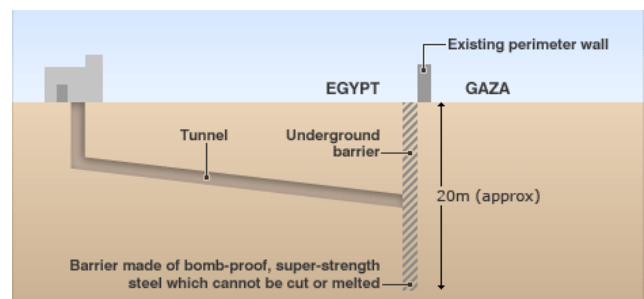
An underground barrier is set for construction by the Egyptian authorities to stop the path of the tunnels into Egypt.
